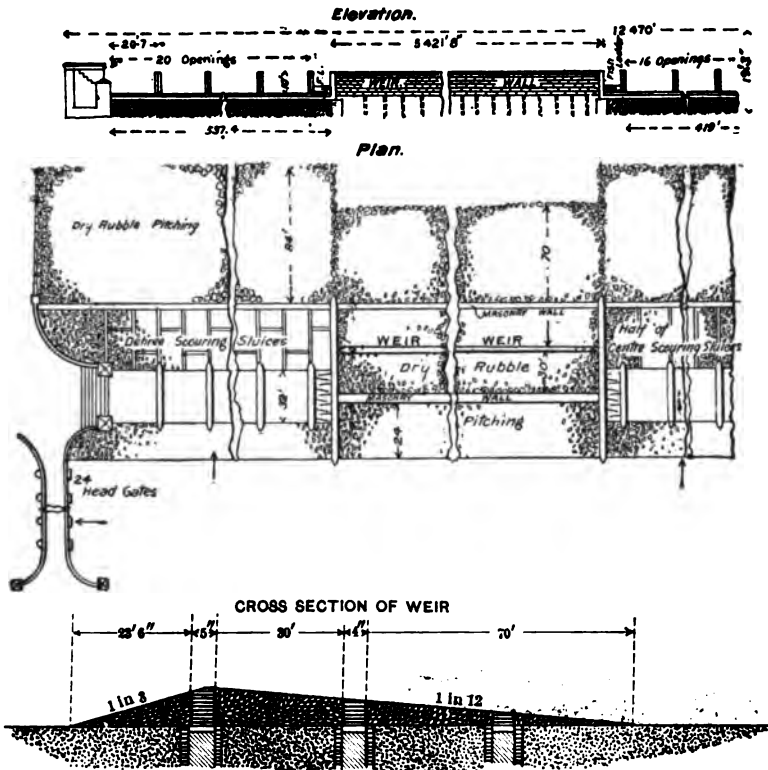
Half-elevation, Plan, and Section, Soane Weir, India.
